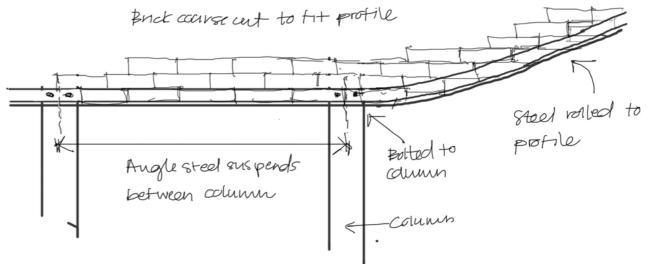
DETAIL A: ROOF EDGE DETAIL 1:10 to scale on A3 Figure 7.5.2: Detail A annotated (Author, 2020)
